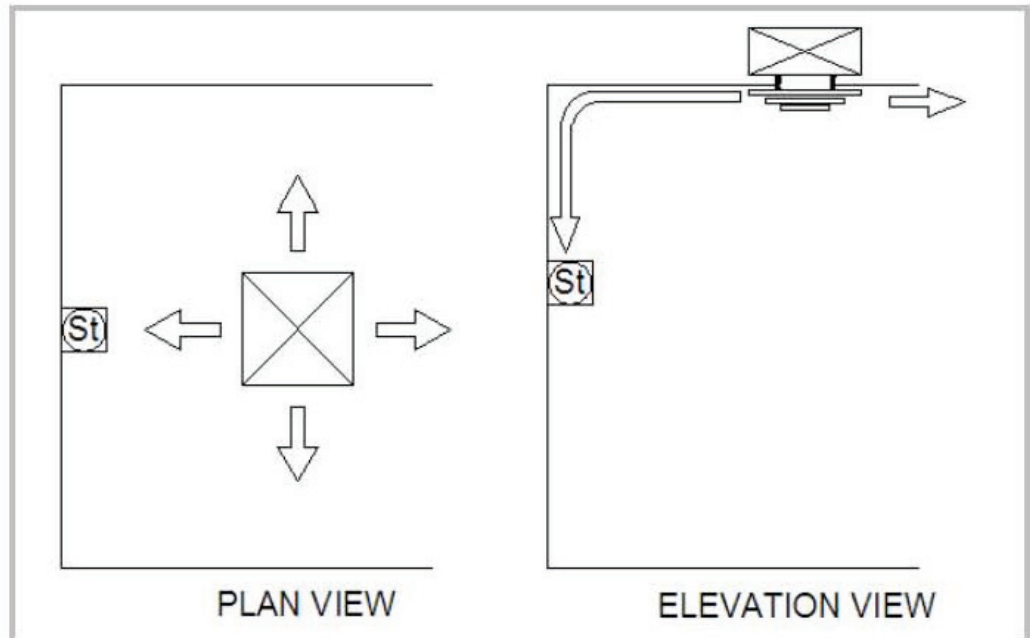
Supply Air Washing Over Room Sensors in Lab Applications
